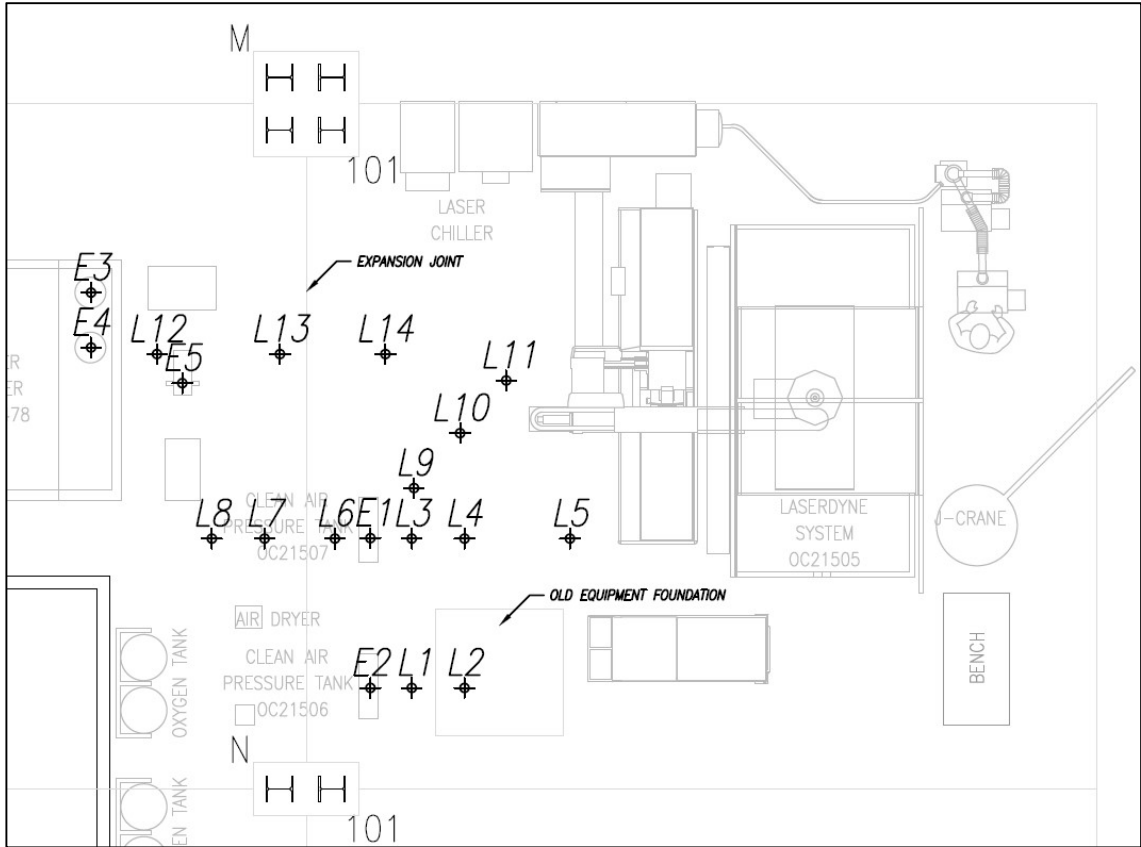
LaserDyne Area Sensor and Equipment Layout
